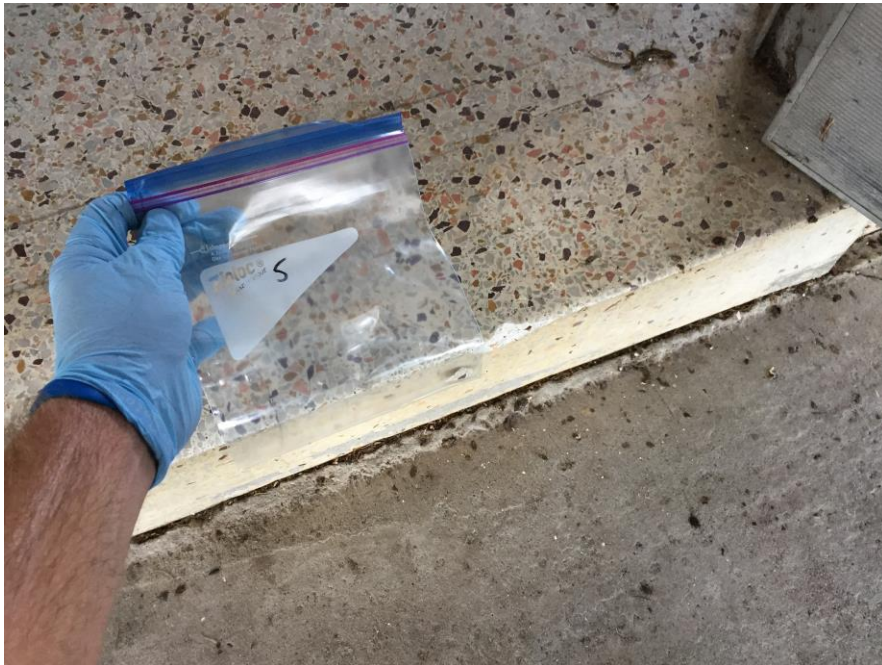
VIEW OF SAMPLED TERRAZZO FLOOR.
